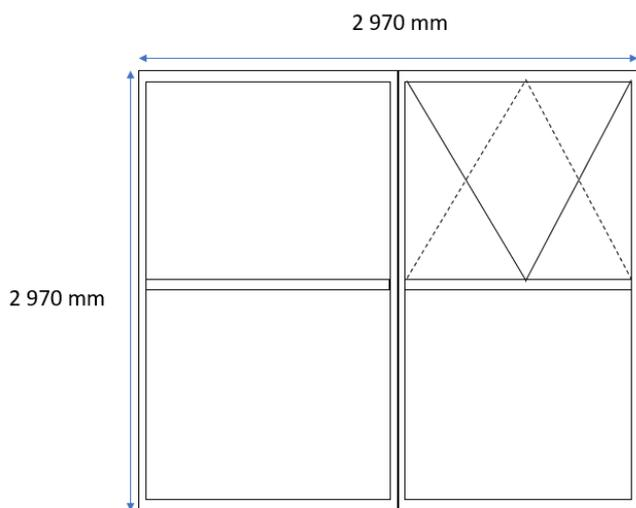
With SW14 Fireguard window it is possible to build non load bearing module walls. NB! Dimensions must be specified with the manufacturer before placing the order.
